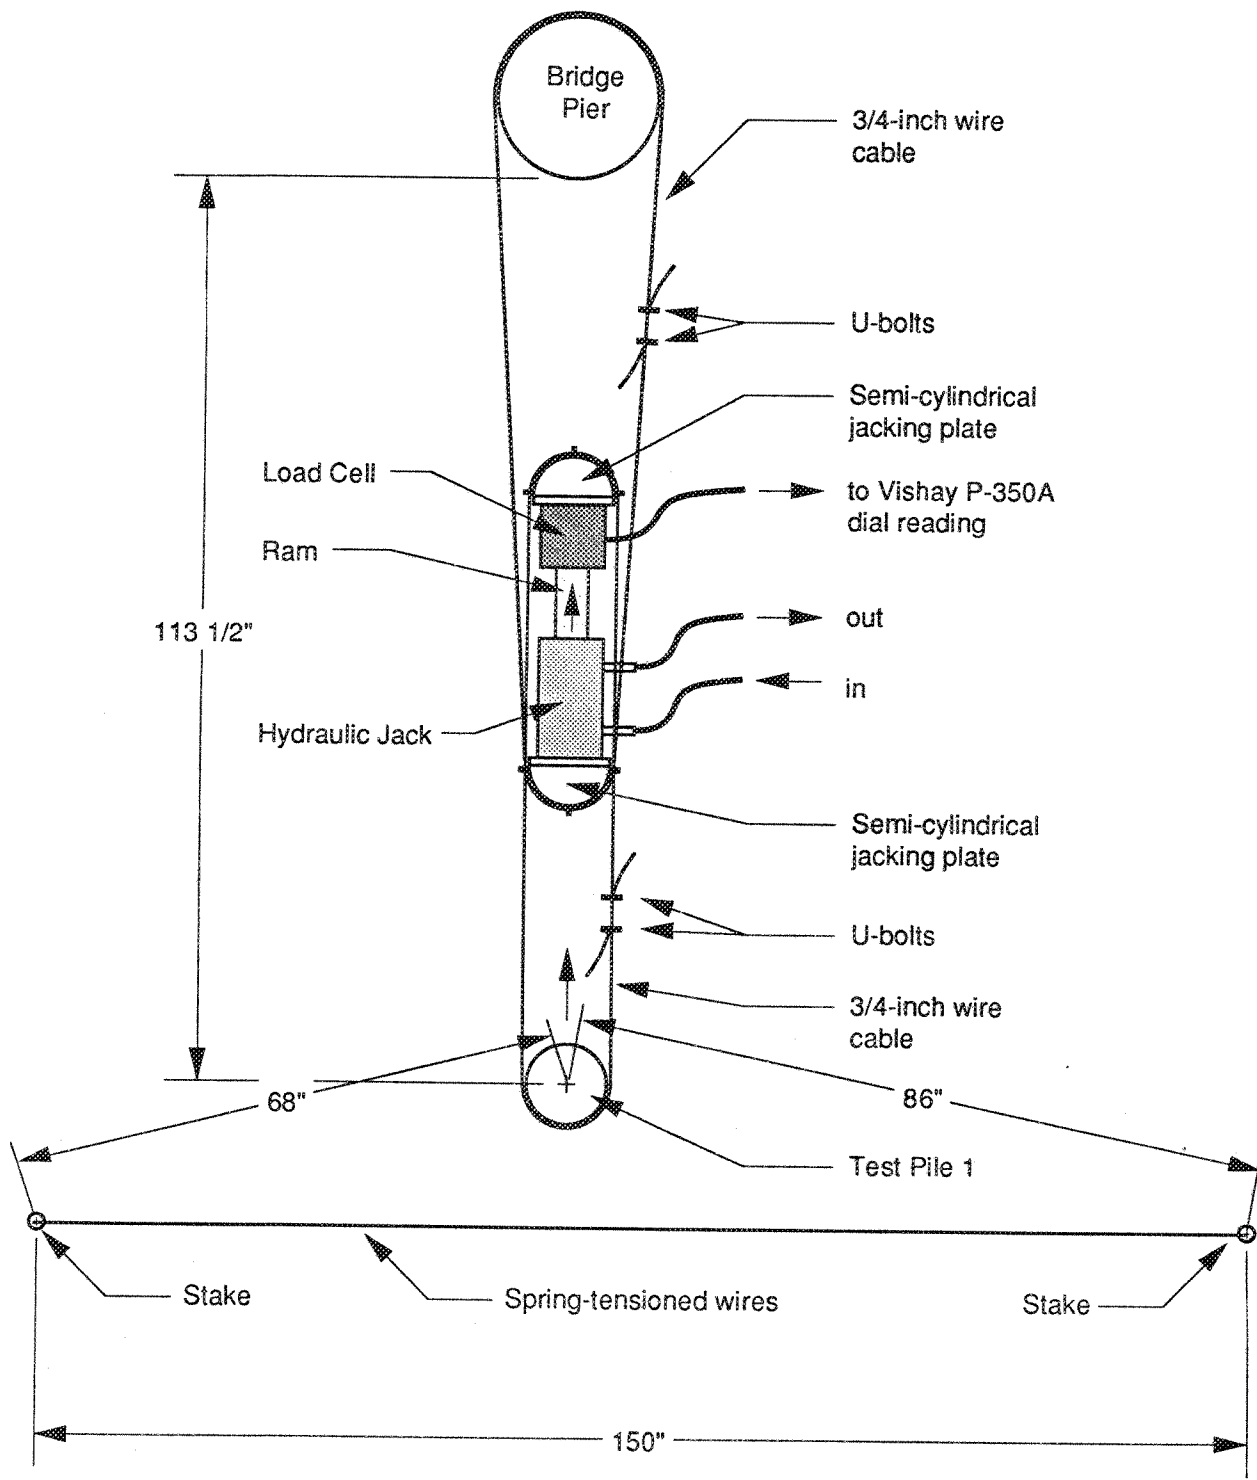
Plan View of Mercer Slough TP1 Test Setup
